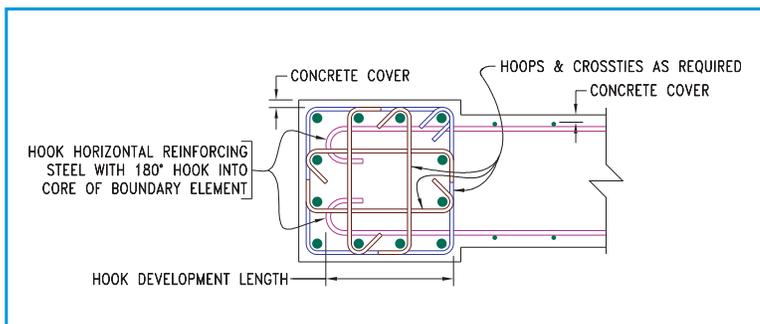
A typical "special" boundary element; reinforcing bars not offset and the most desirable.
